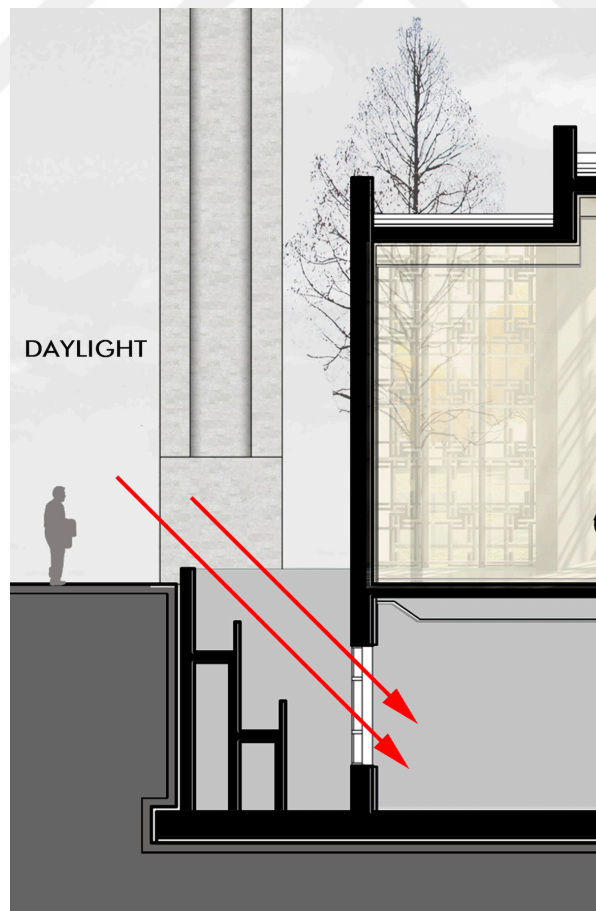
Sub-basement Floors Receiving Sunlight through the Cascades (Öztürk 2021)
